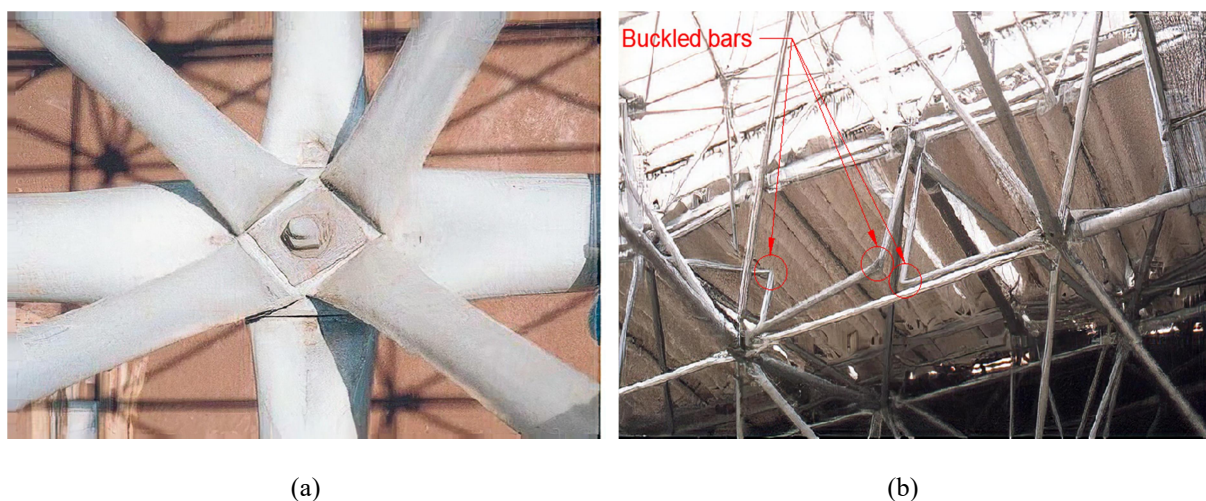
End-flattened steel bars assemblage (a) and the collapse of a three-dimensional truss (b) [5]
